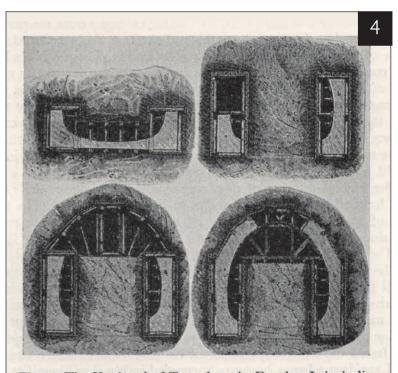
The Köningsdorf Tunnel on the Dresden-Leipzig line was driven in 1837. In this tunnel the foundation for the lining was placed first, after which the masonry lining was put in. With the lining in place the central core was removed.
